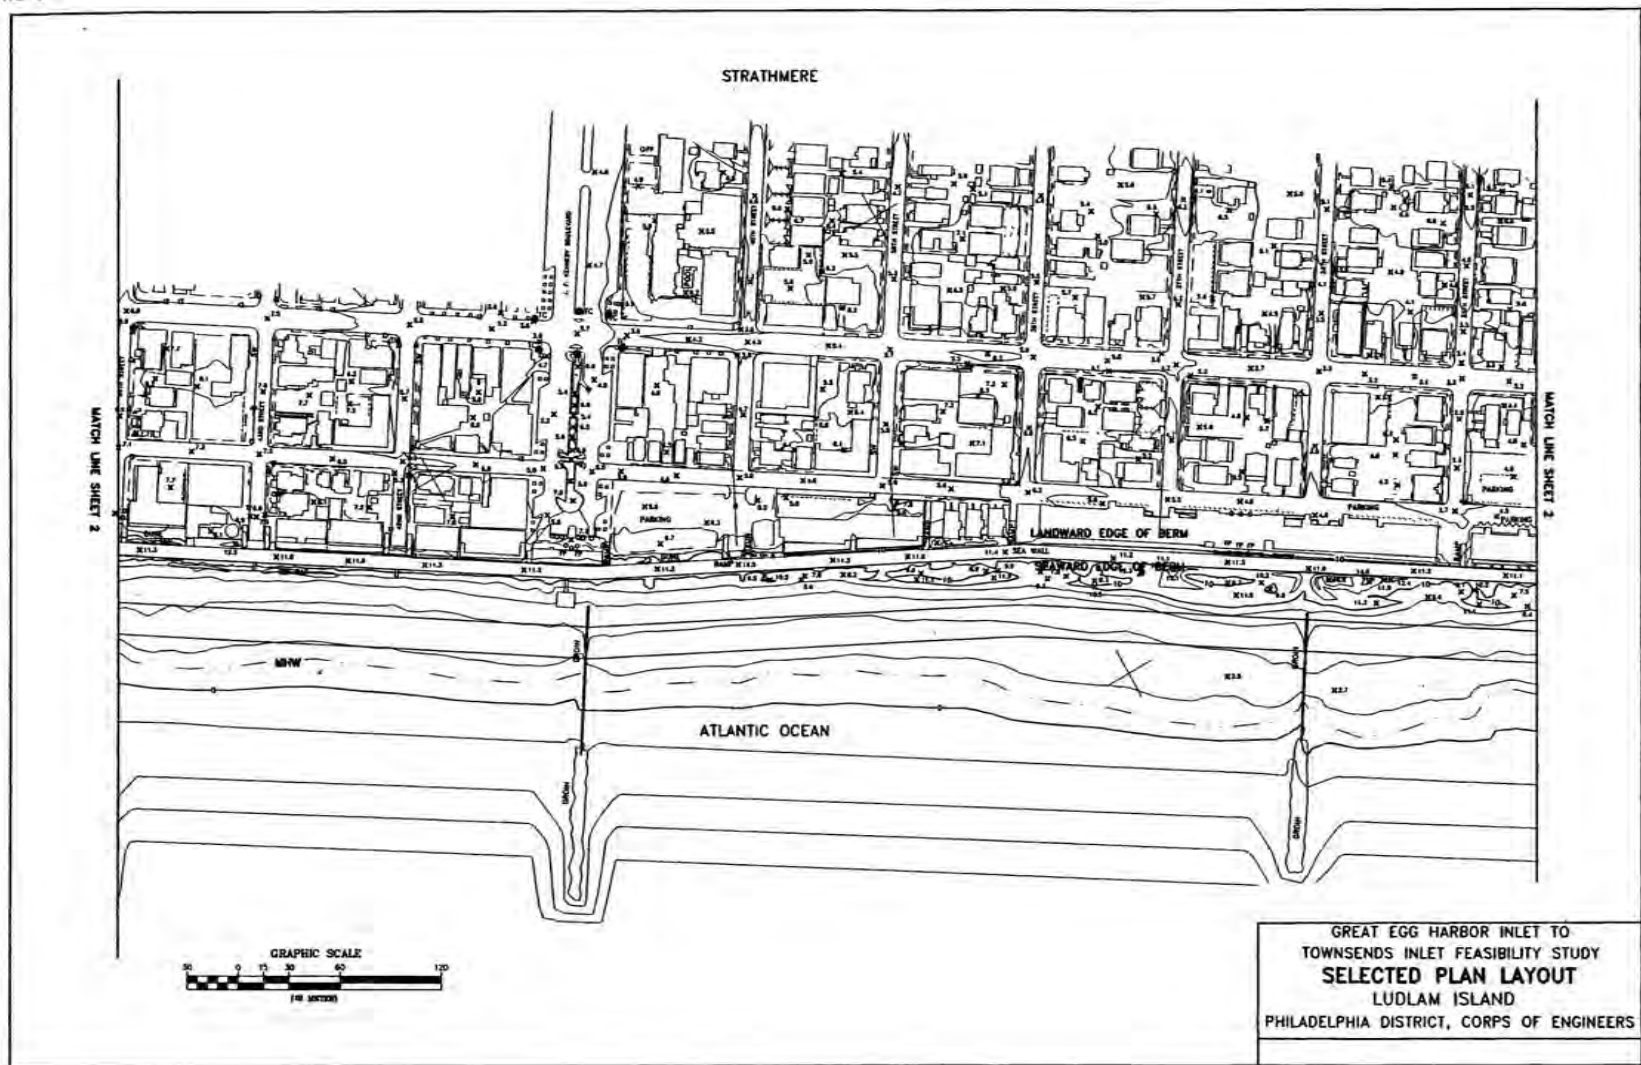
Selected Plan Layout for Ludlam Island, NJ – 34th Street to 44th Street, Sea Isle City
